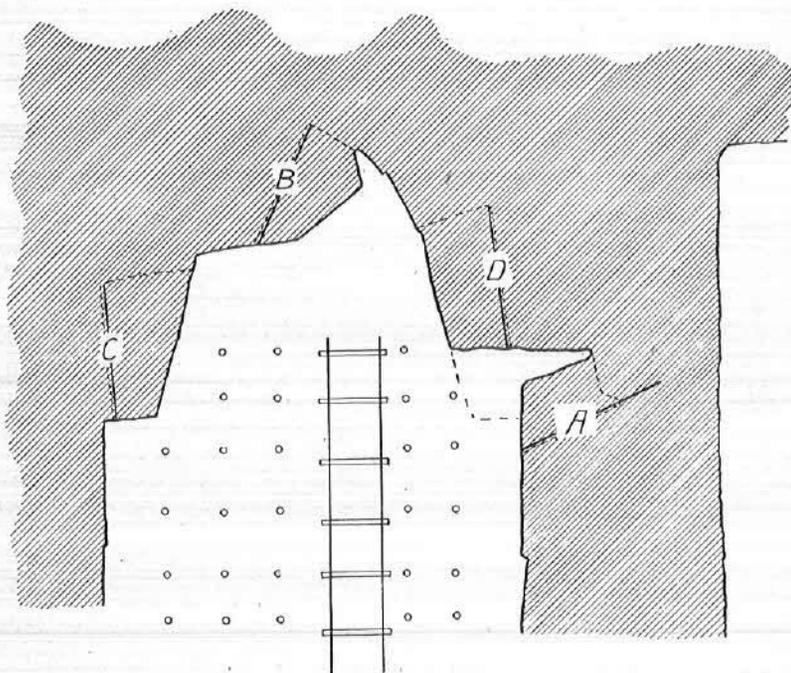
Plan of a room in which strong coal has been cut before blasting. This shows also the second shot of a crosscut or break-through.
